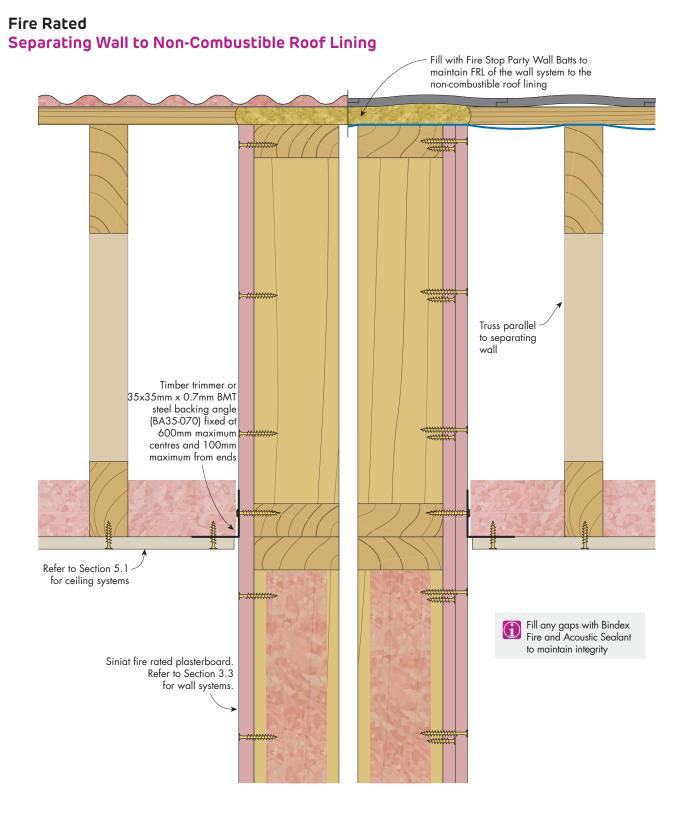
Separating Wall to Non-combustible Roof Lining Section
